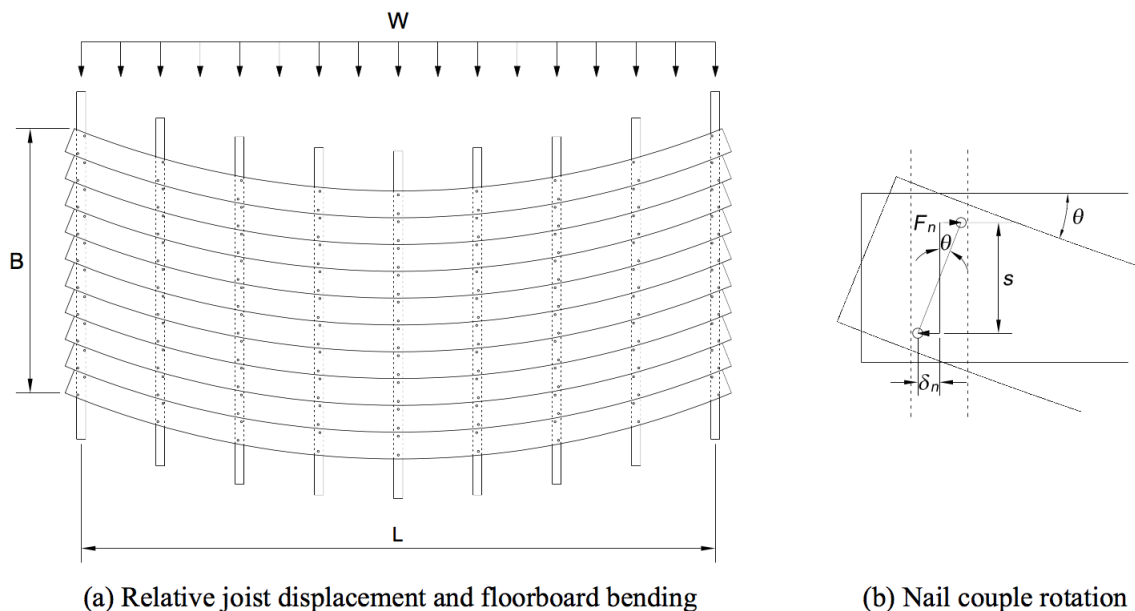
Diaphragm deformation for loading parallel to joists [12]
